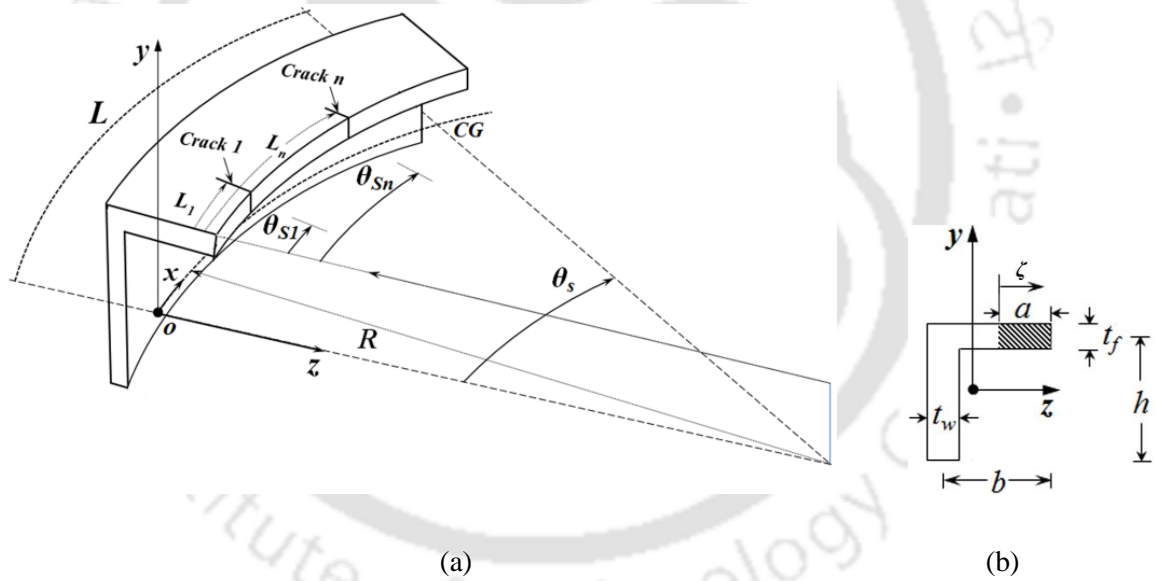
(a) Configuration of cracked angle cross-sectional horizontally curved beam, (b) cross-section of the cracked beam portion
